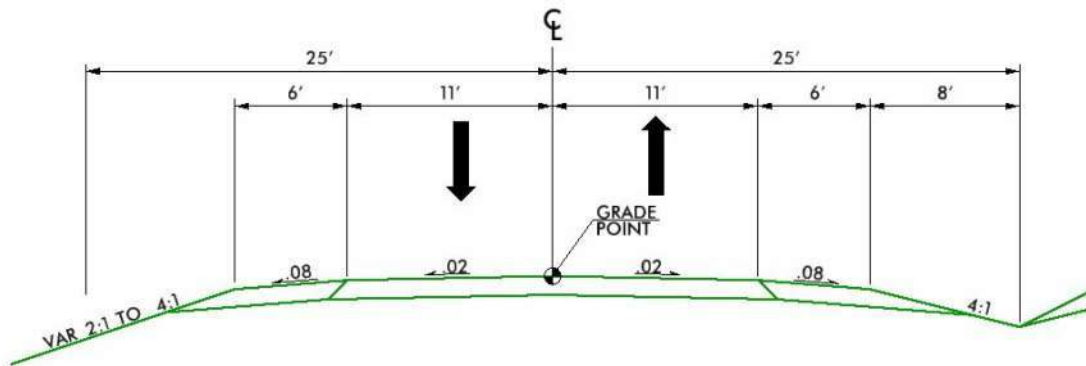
SUBDIVISION ROAD TYPICAL SECTION
